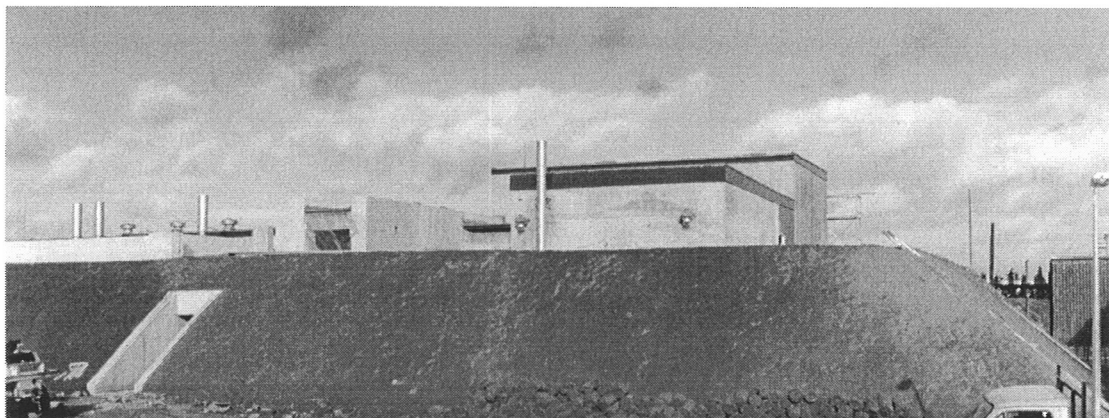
Explosives processing building designed and constructed in accord with the principals of US Department of Defence TM5-1300.
